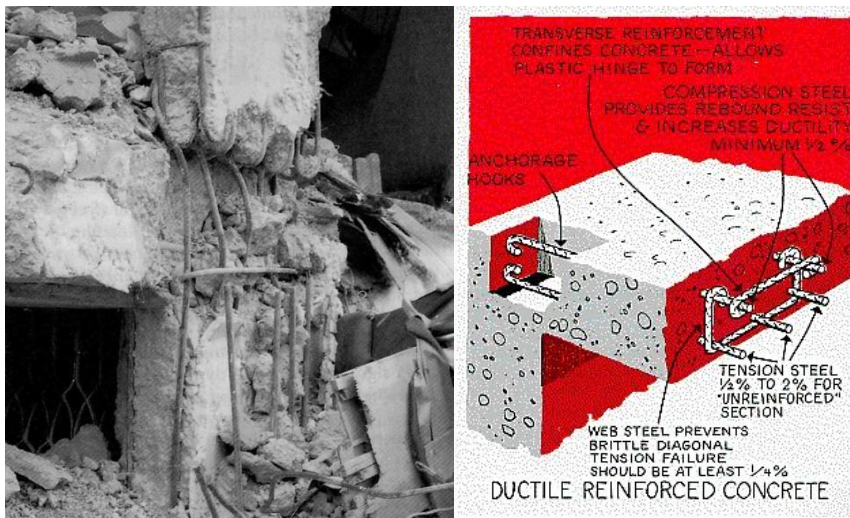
Typical Structure Cross Section Showing Recommended Reinforcement Details.
